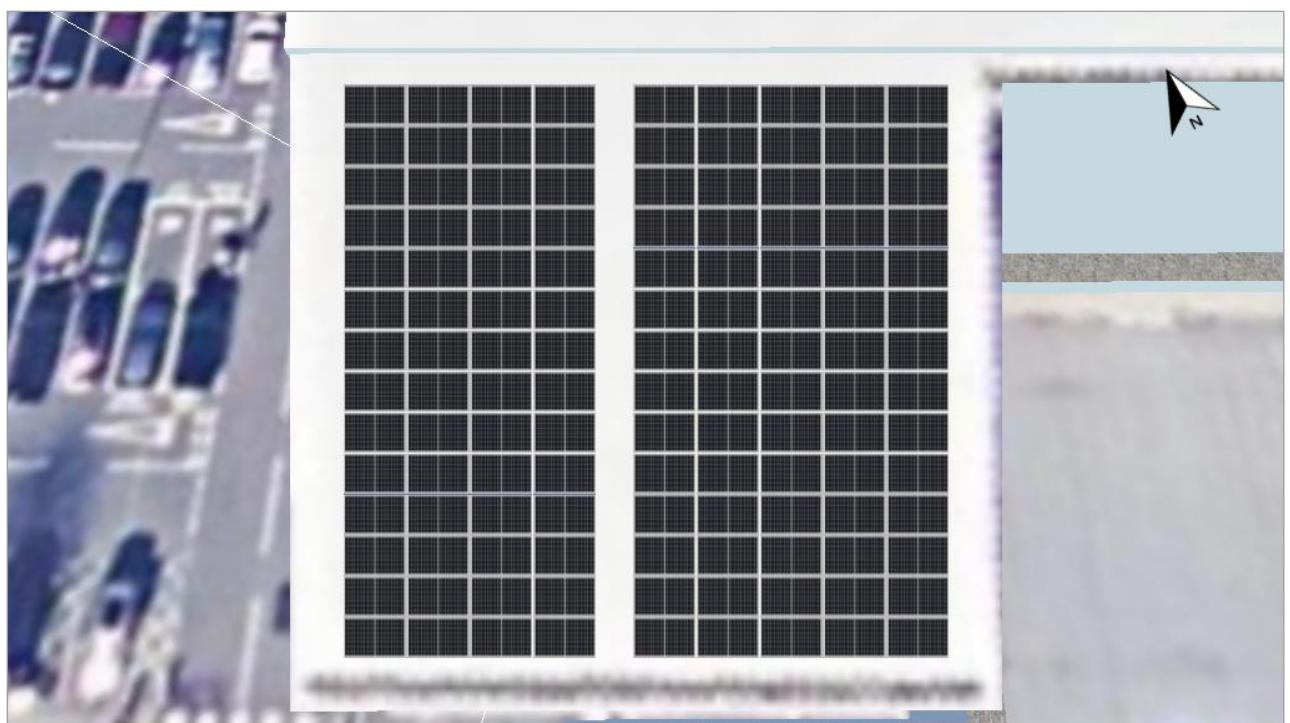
Module Area - Arbitrary Building 02-Mounting Surface Southwest
